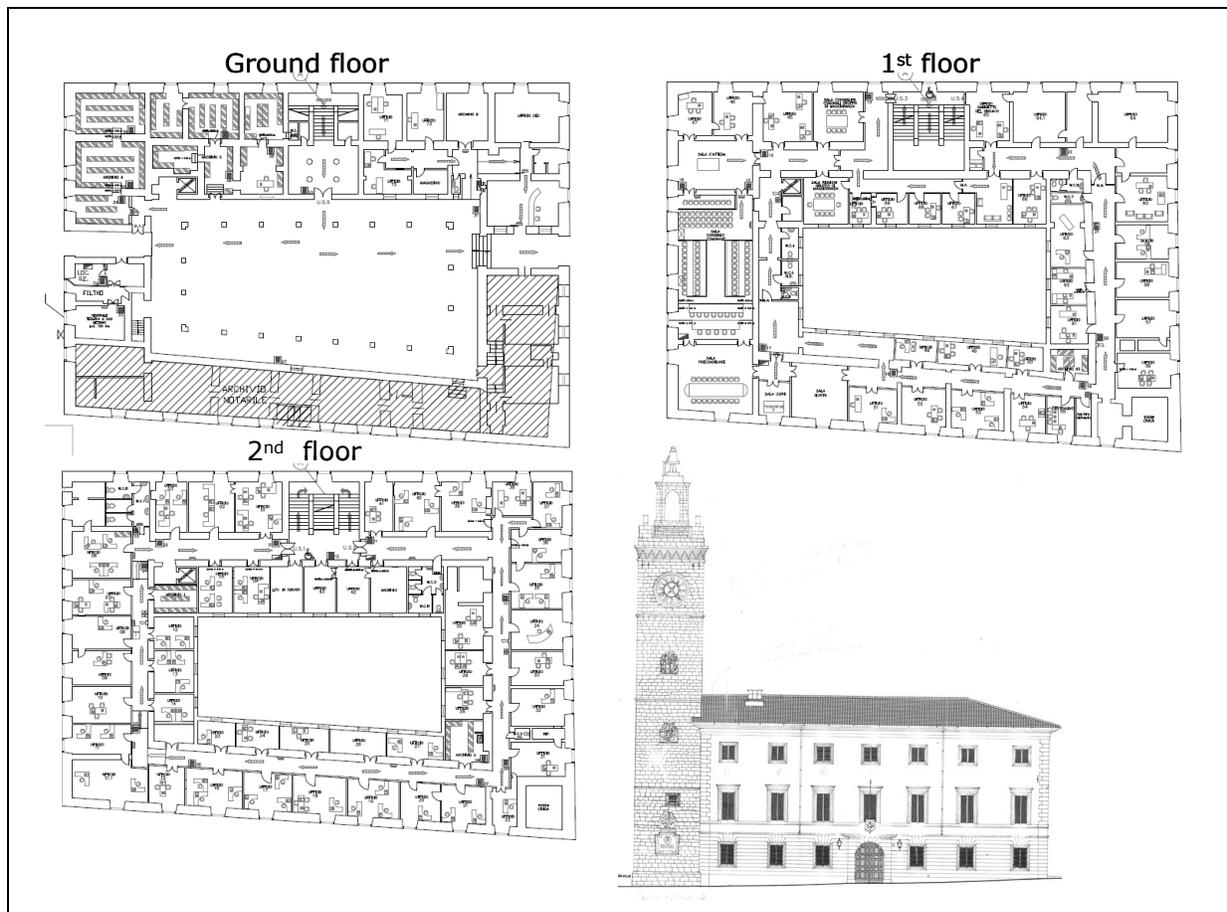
Plan views of the buildings and front view in Piazza Palazzo
